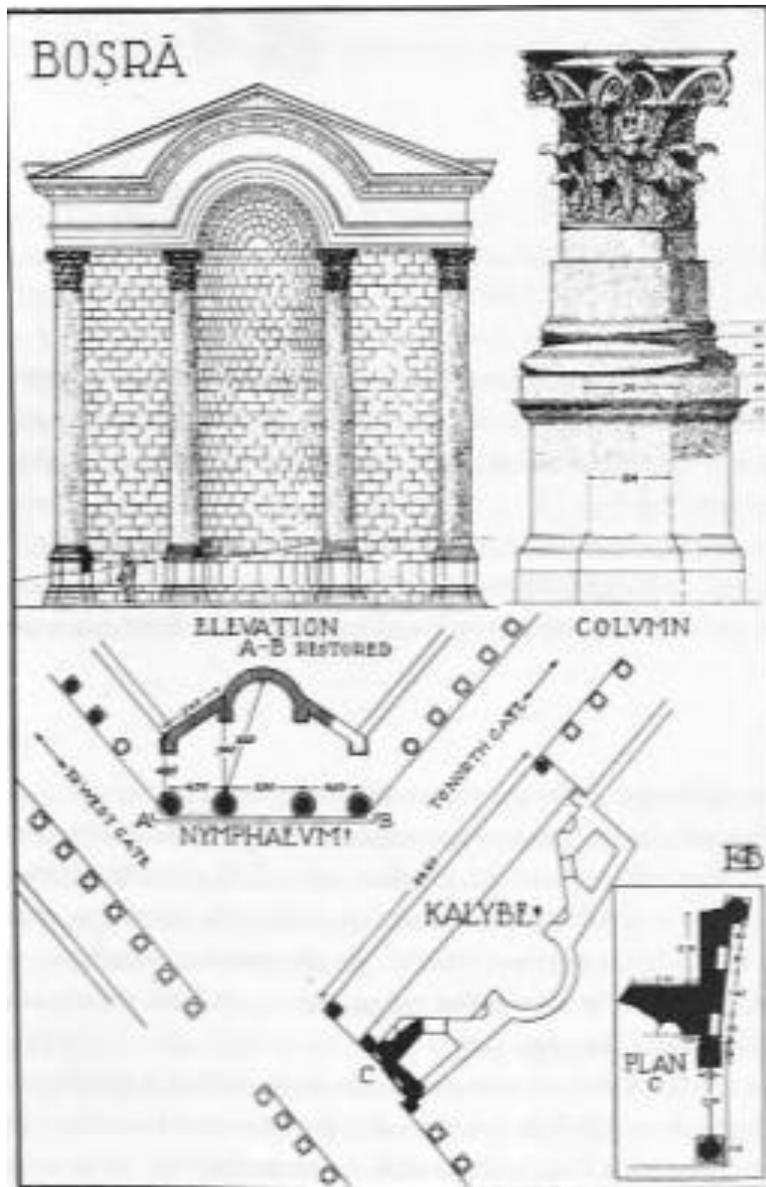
Bosra, the *nymphaeum*, plan and elevation suggested reconstruction. Extracted from: Segal 1997.
